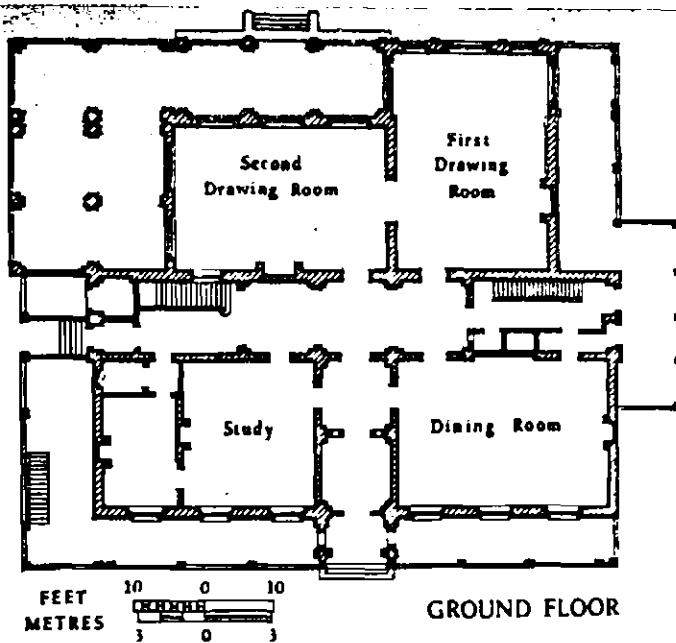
No. 24 Kensington Palace Gardens, ground-floor plan in 1845
